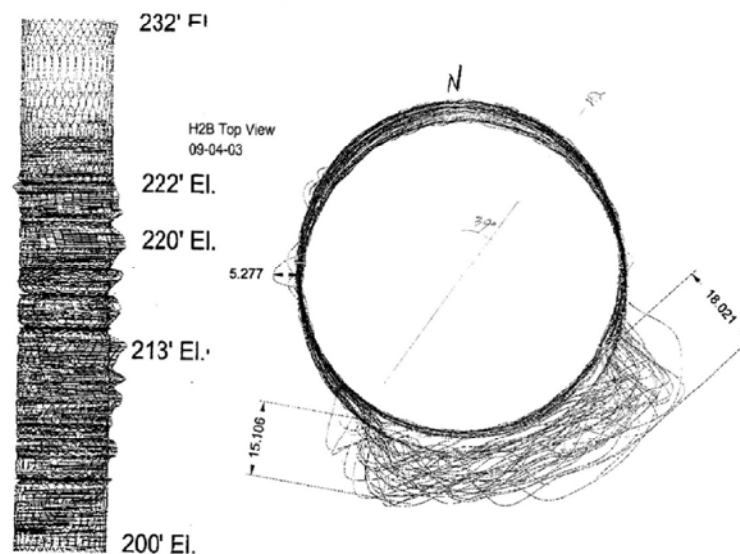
Shaft H2B Sonar Caliper (Before Remediation)
